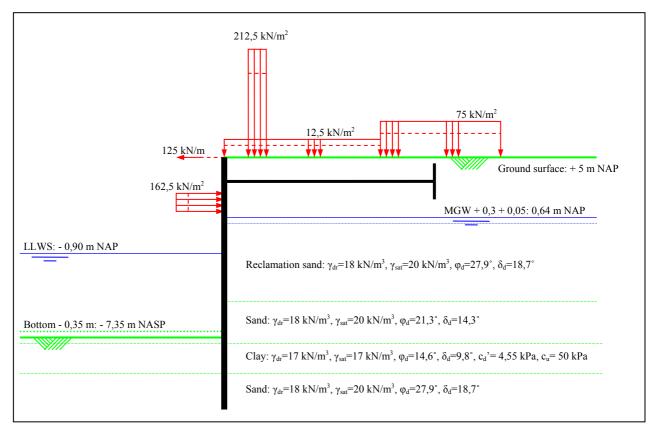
Design values (situation without drainage system) for sheet pile calculation for limit state 1A
